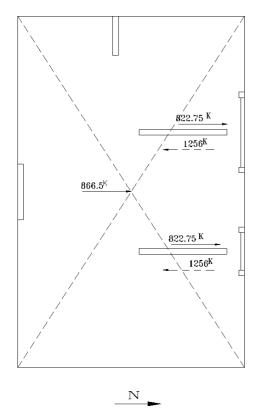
Forces on the third floor diaphragm due to N-S seismic loading (Wall shears above the diaphragm are shown with solid arrows while wall shears below the diaphragm are indicated by dashed lines.)
